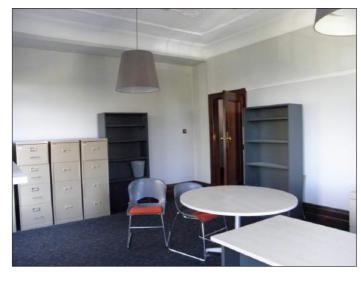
Room 101. It is proposed to remove the plasterboard wall that divides this room from Room 102.
